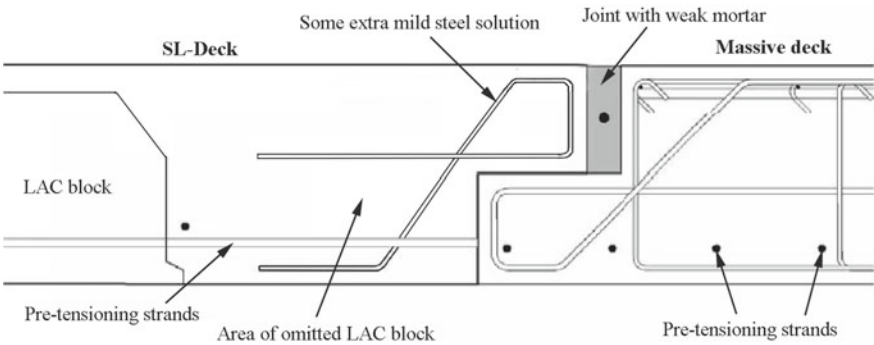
Example of solution in blade connection where SL-Deck rests on a massive deck spanning in the opposite direction
